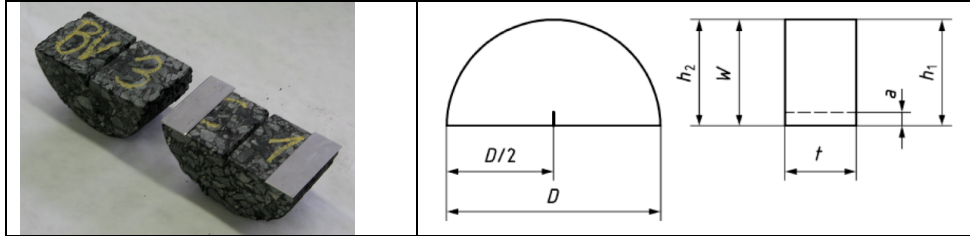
Semi-cylindrical test specimens, including specific dimensions of the specimen
